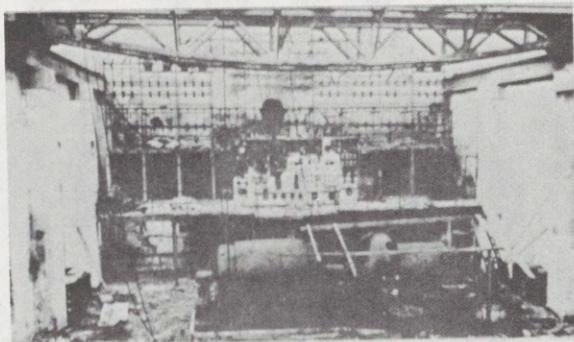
Building 131A. Looking North Showing Turbo-Generator and Burned Out Electrical Panels at North End of Building
